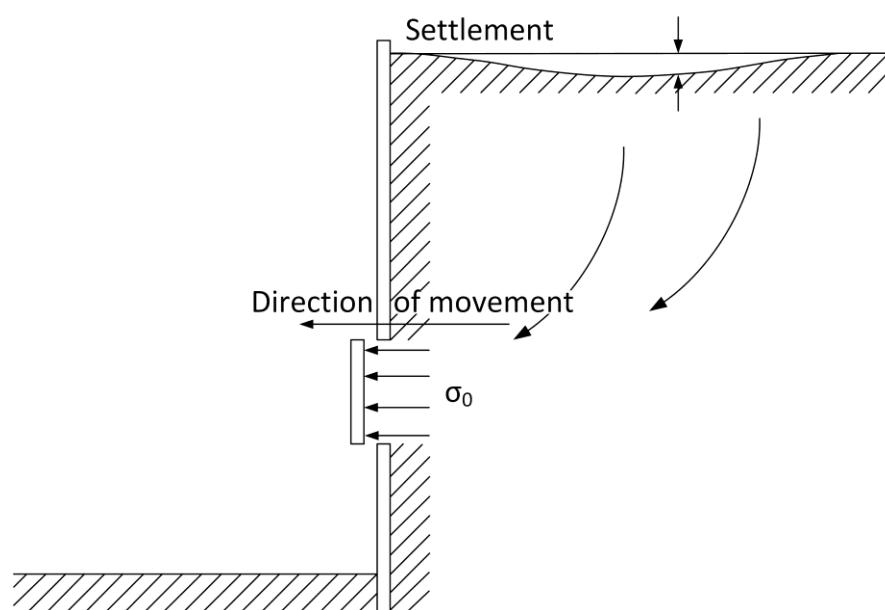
Layout of a circular opening in the vertical sheet pile wall [Broms & Bennermark, 1967]
